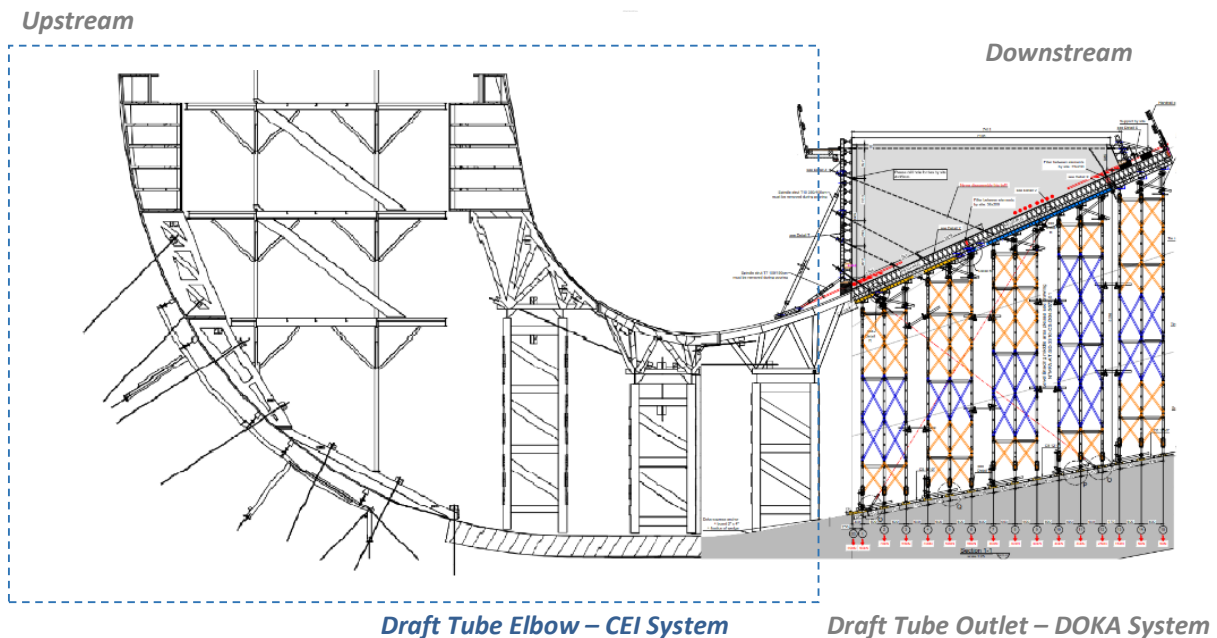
Section A-A from Figure 3: Typical section of draft tube and outlet Formwork Systems
